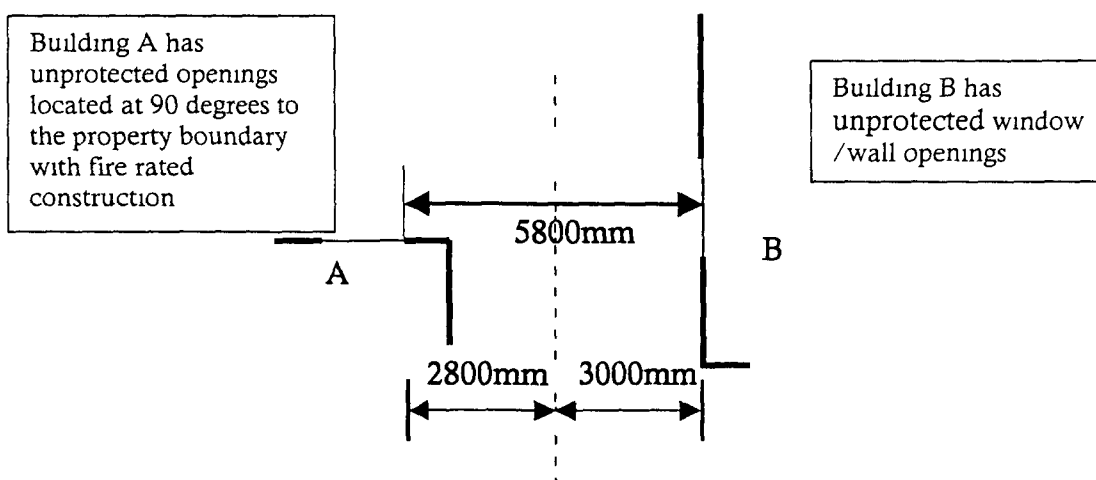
3 Plan view showing existing situation where non compliant openings of subject building (Building A) are located 2800mm from boundary and Building B set back 3000mm from property boundary
